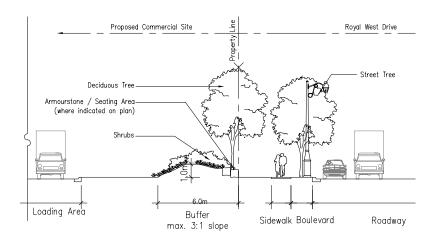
Buffer Type A1 at Royal West Drive - Typical section
